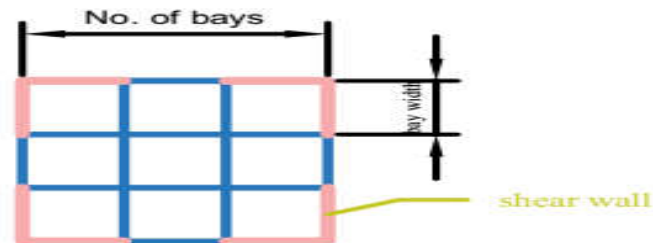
Plan of the Building (Shows the Location of the Shear Walls) Case 1.
